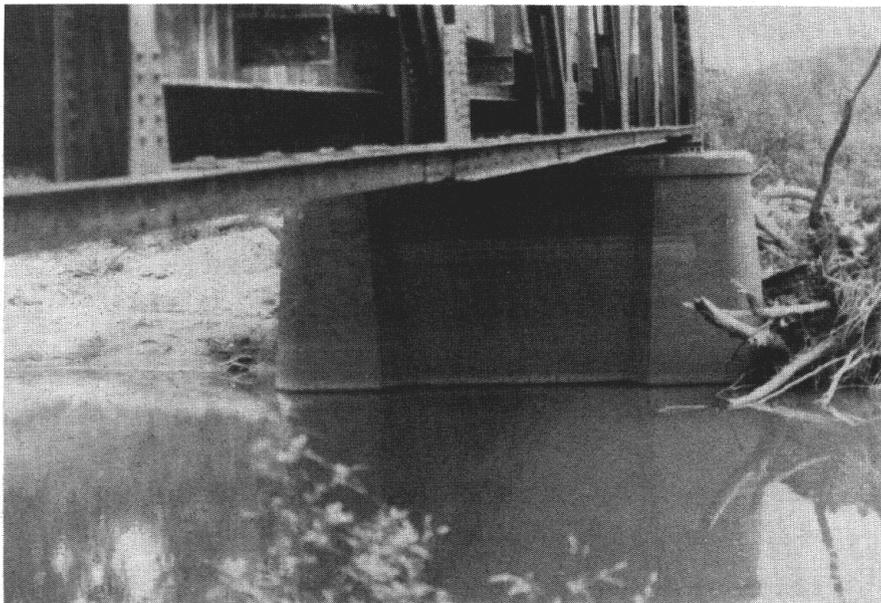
Elkhorn Street Bridge, South River, Warren County.
